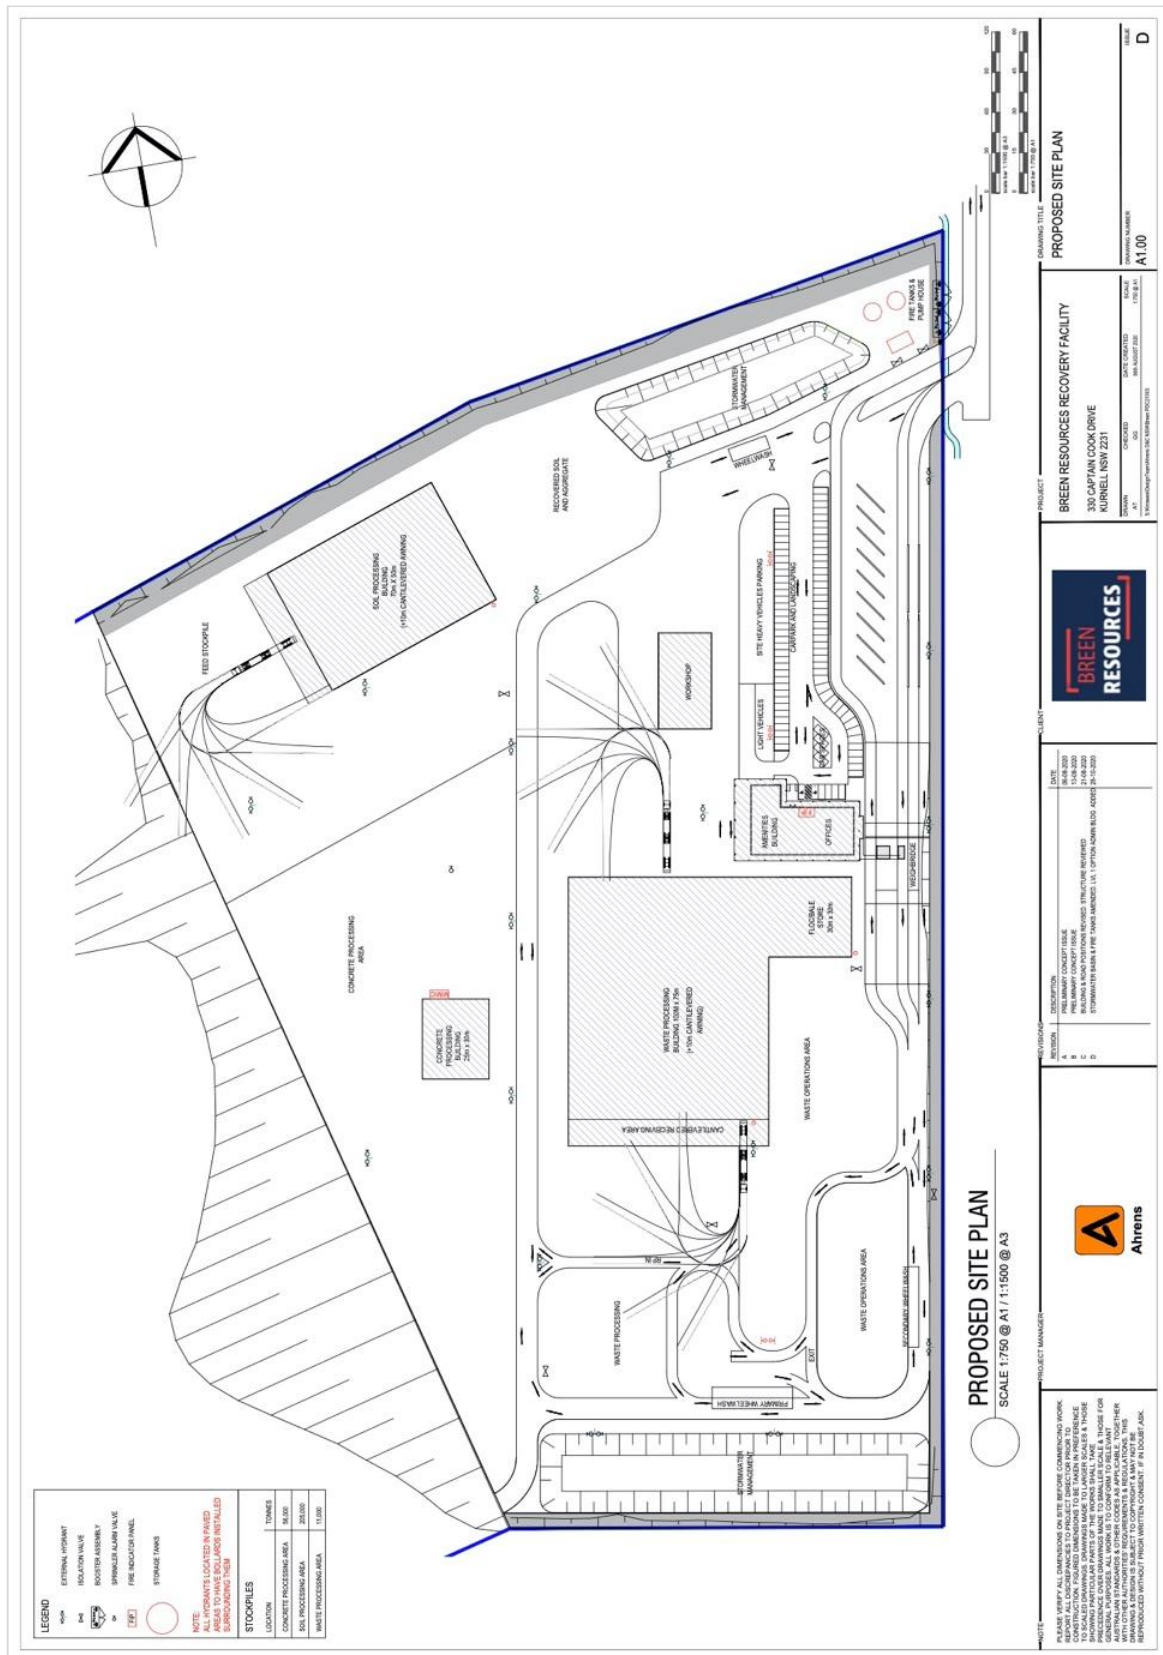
Proposed New Resource Recovery Facility Layout Plan
